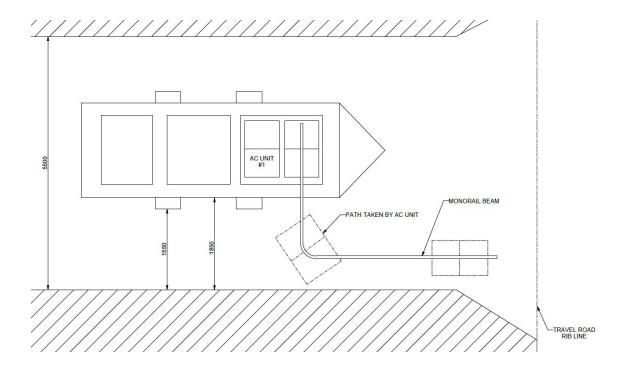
Top view of belt starter showing method with which the AC units could be removed with an overhead monorail system.
